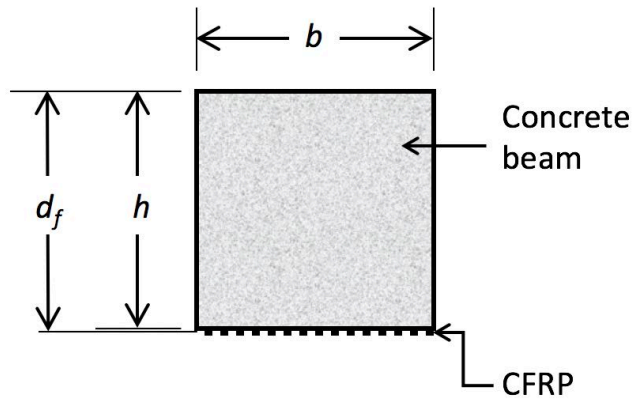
Schematic of the section view of the beam with CFRP external reinforcement
